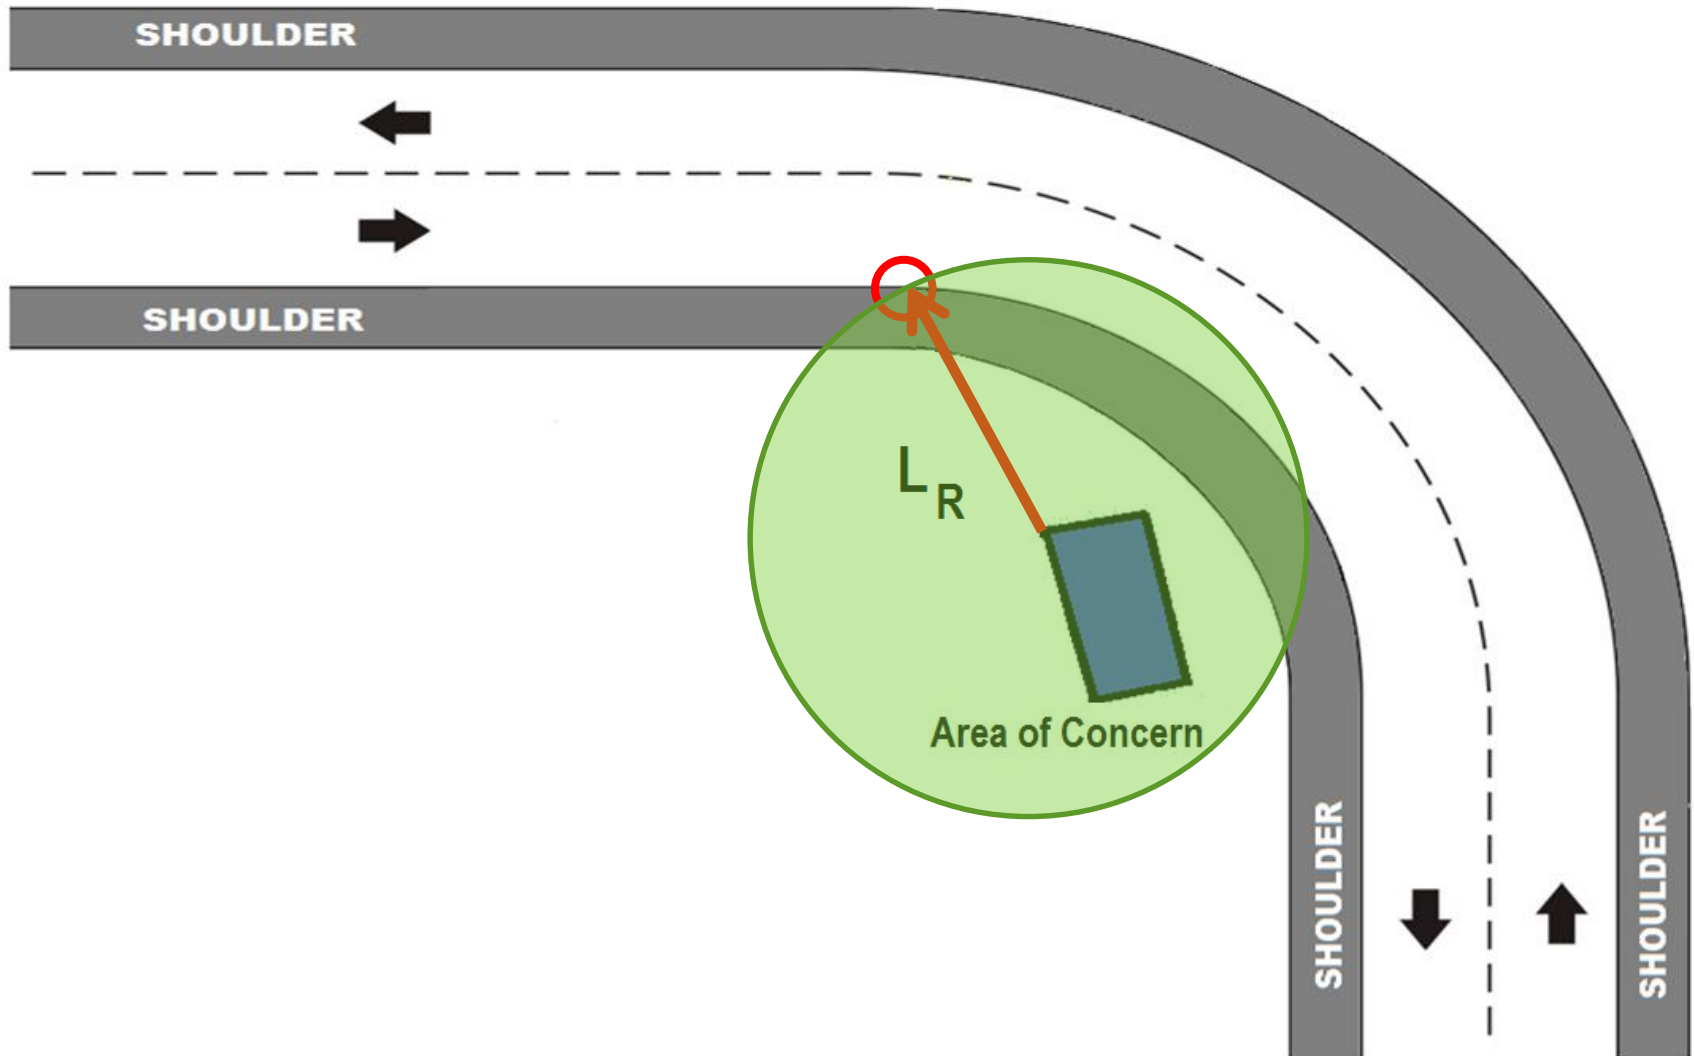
DETAIL OF GUARDRAIL PLACEMENT ON APPROACH END OF HAZARD LOCATED ON A HORIZONTAL CURVE
